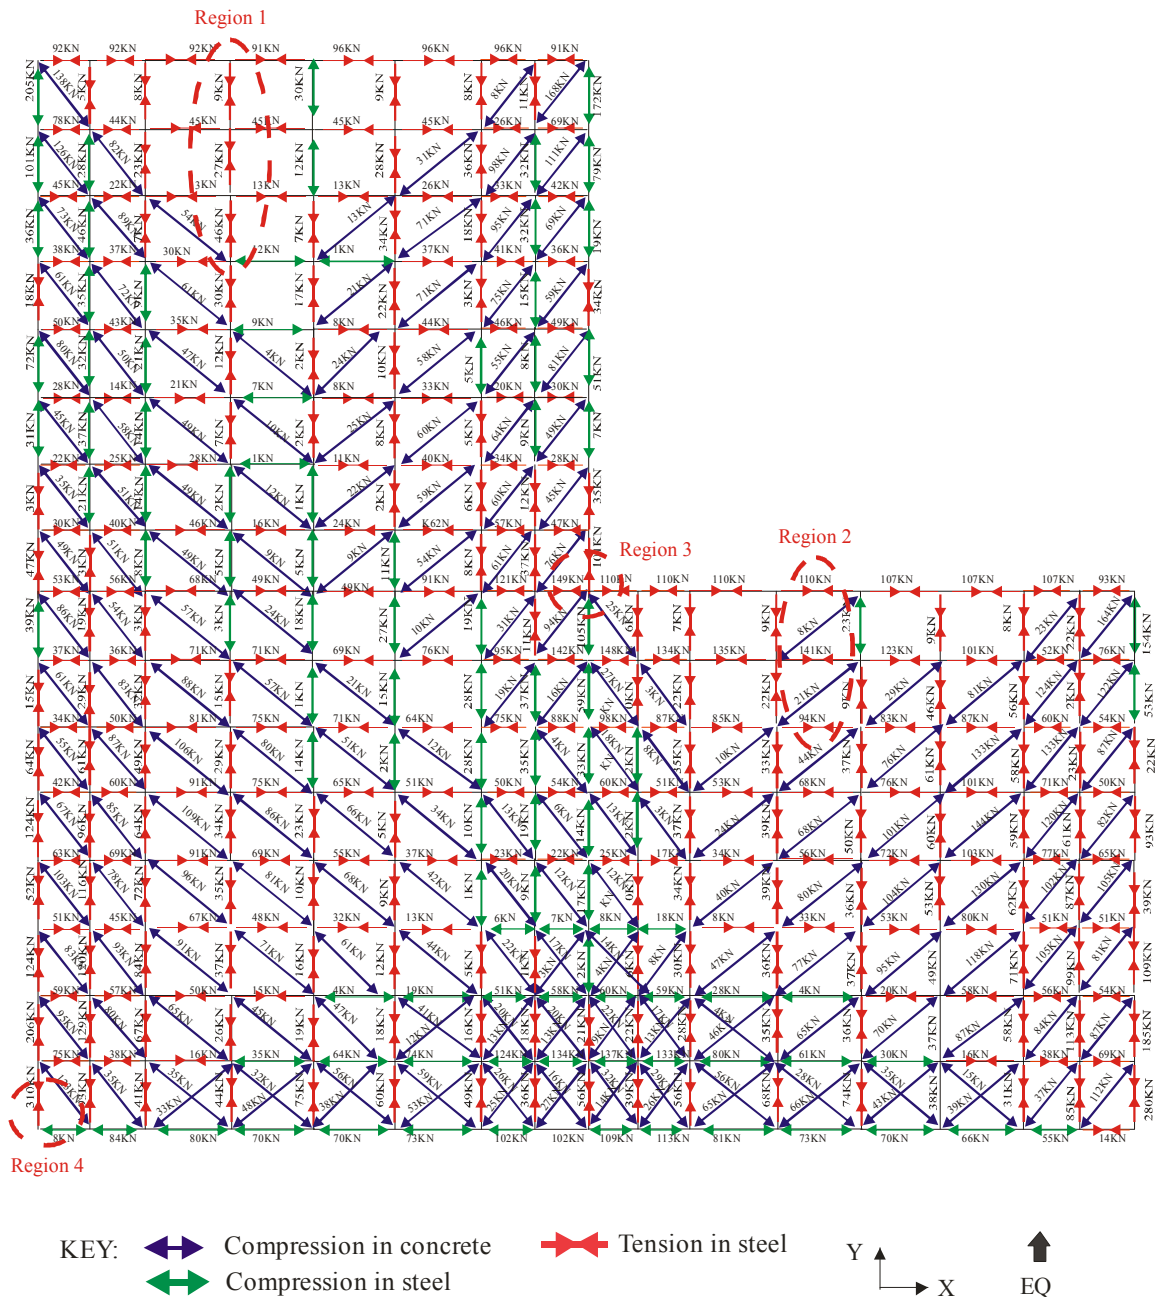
Strut and tie solution for L-shaped floor with 52 degree compression struts at columns for refined mesh
